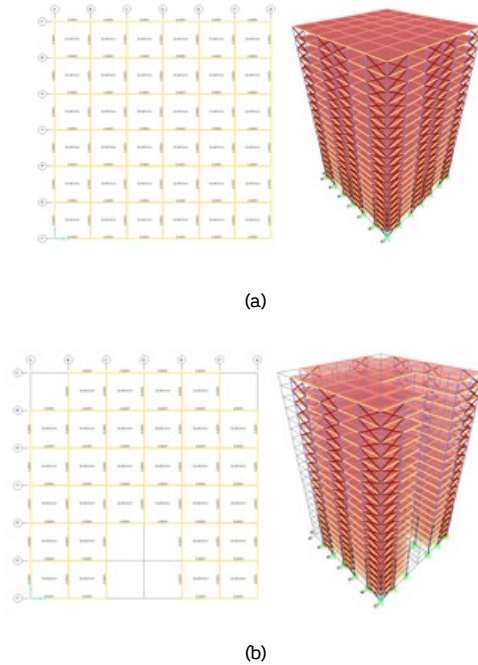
Finite element model of the 20-story building; a) symmetric model, b) asymmetric model
